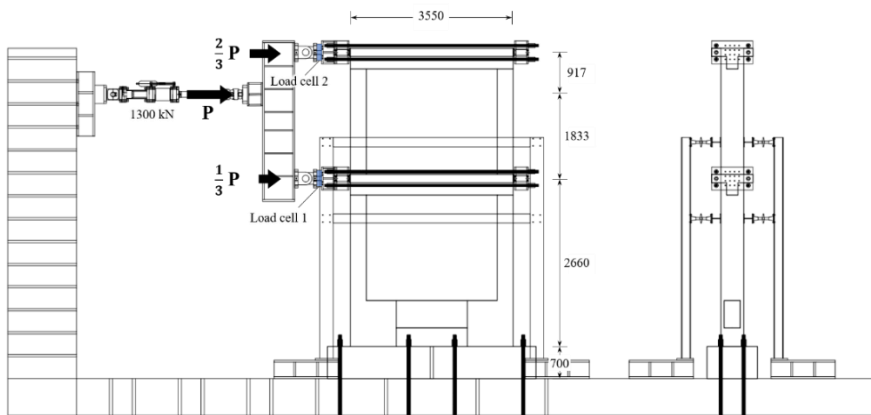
Test setup for cyclic test of two-story moment frame specimen
